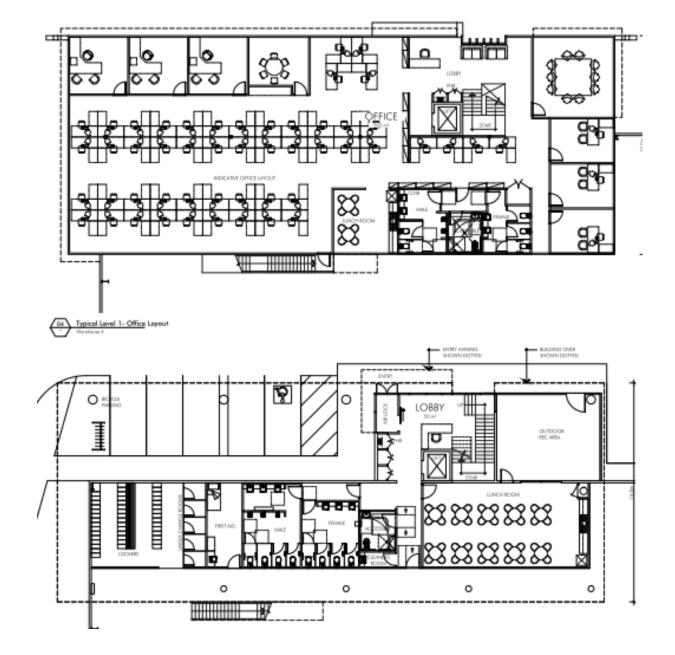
Warehouse 4 - office floor plans on Ground Floor and Level 1
